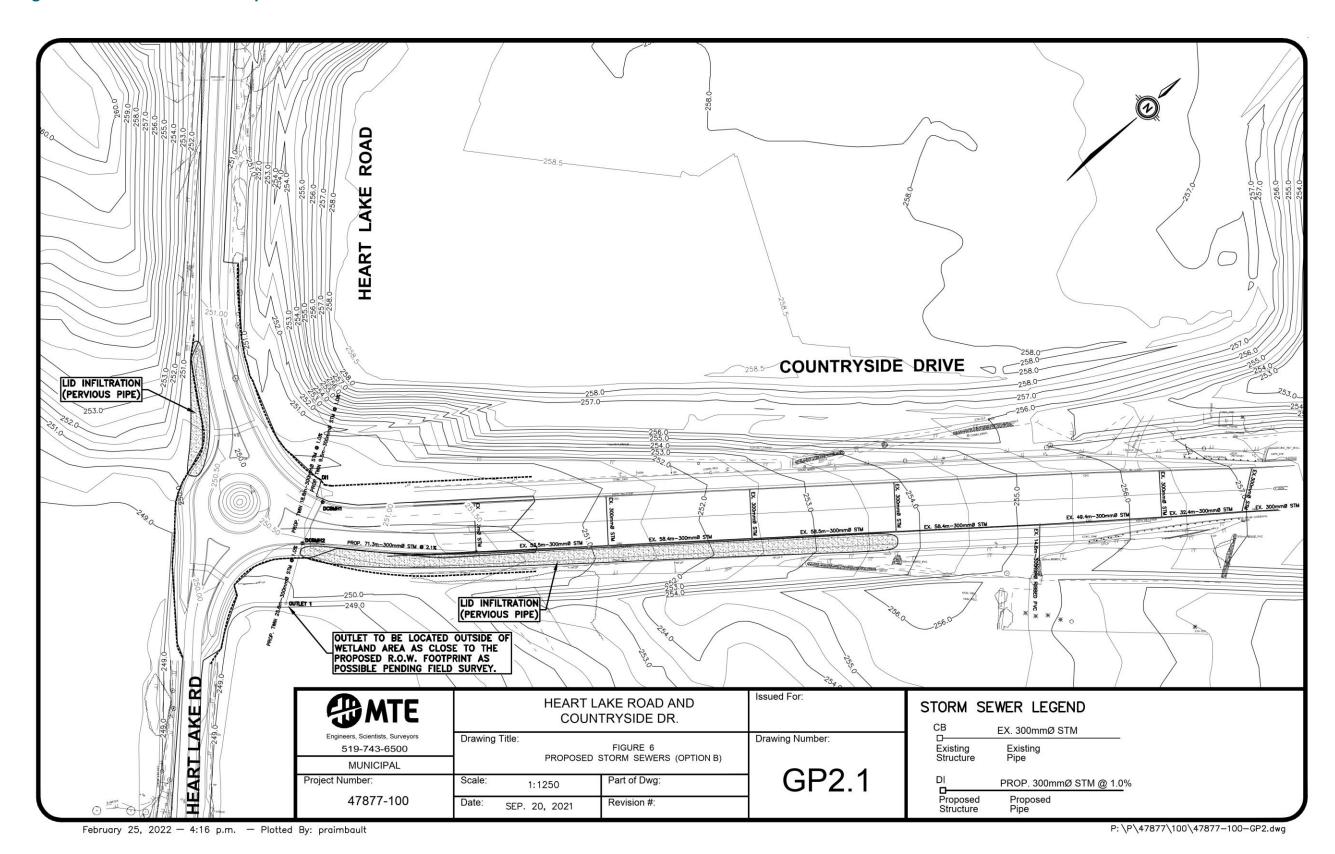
Roundabout Proposed Storm Sewers
